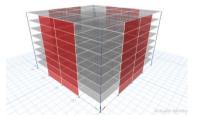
G+6 Building with RCC Shear wall on Outer peripheral middle
